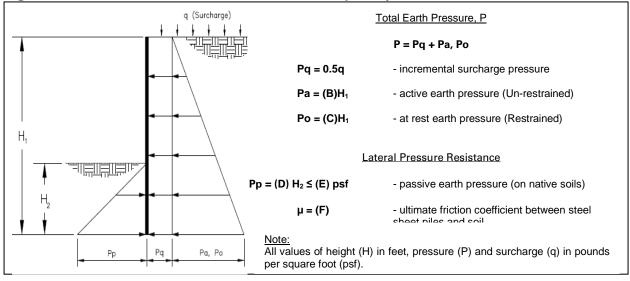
, Lateral Earth Pressures on Temporary Cantilever Wall
